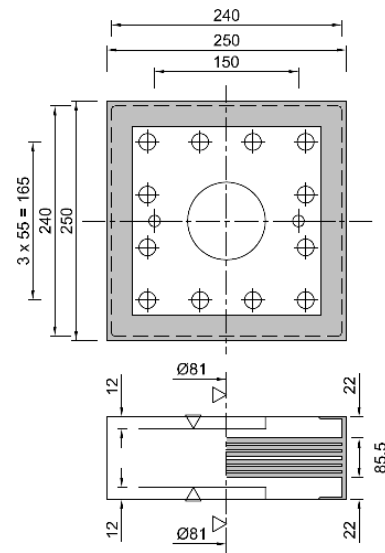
Specimen of laminated bearing; Bearing dimensions are presented in Table 1.
